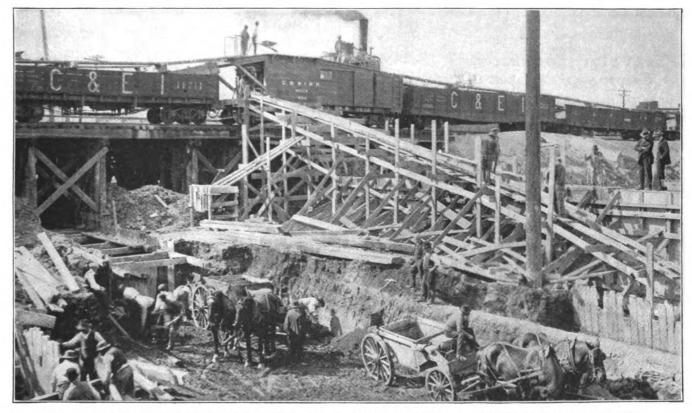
CONCRETING TRAIN PLACING THE FOUNDATIONS FOR BRIDGE ABUTMENTS AND RETAINING WALLS; CHICAGO & WESTERN INDIANA R.R.
